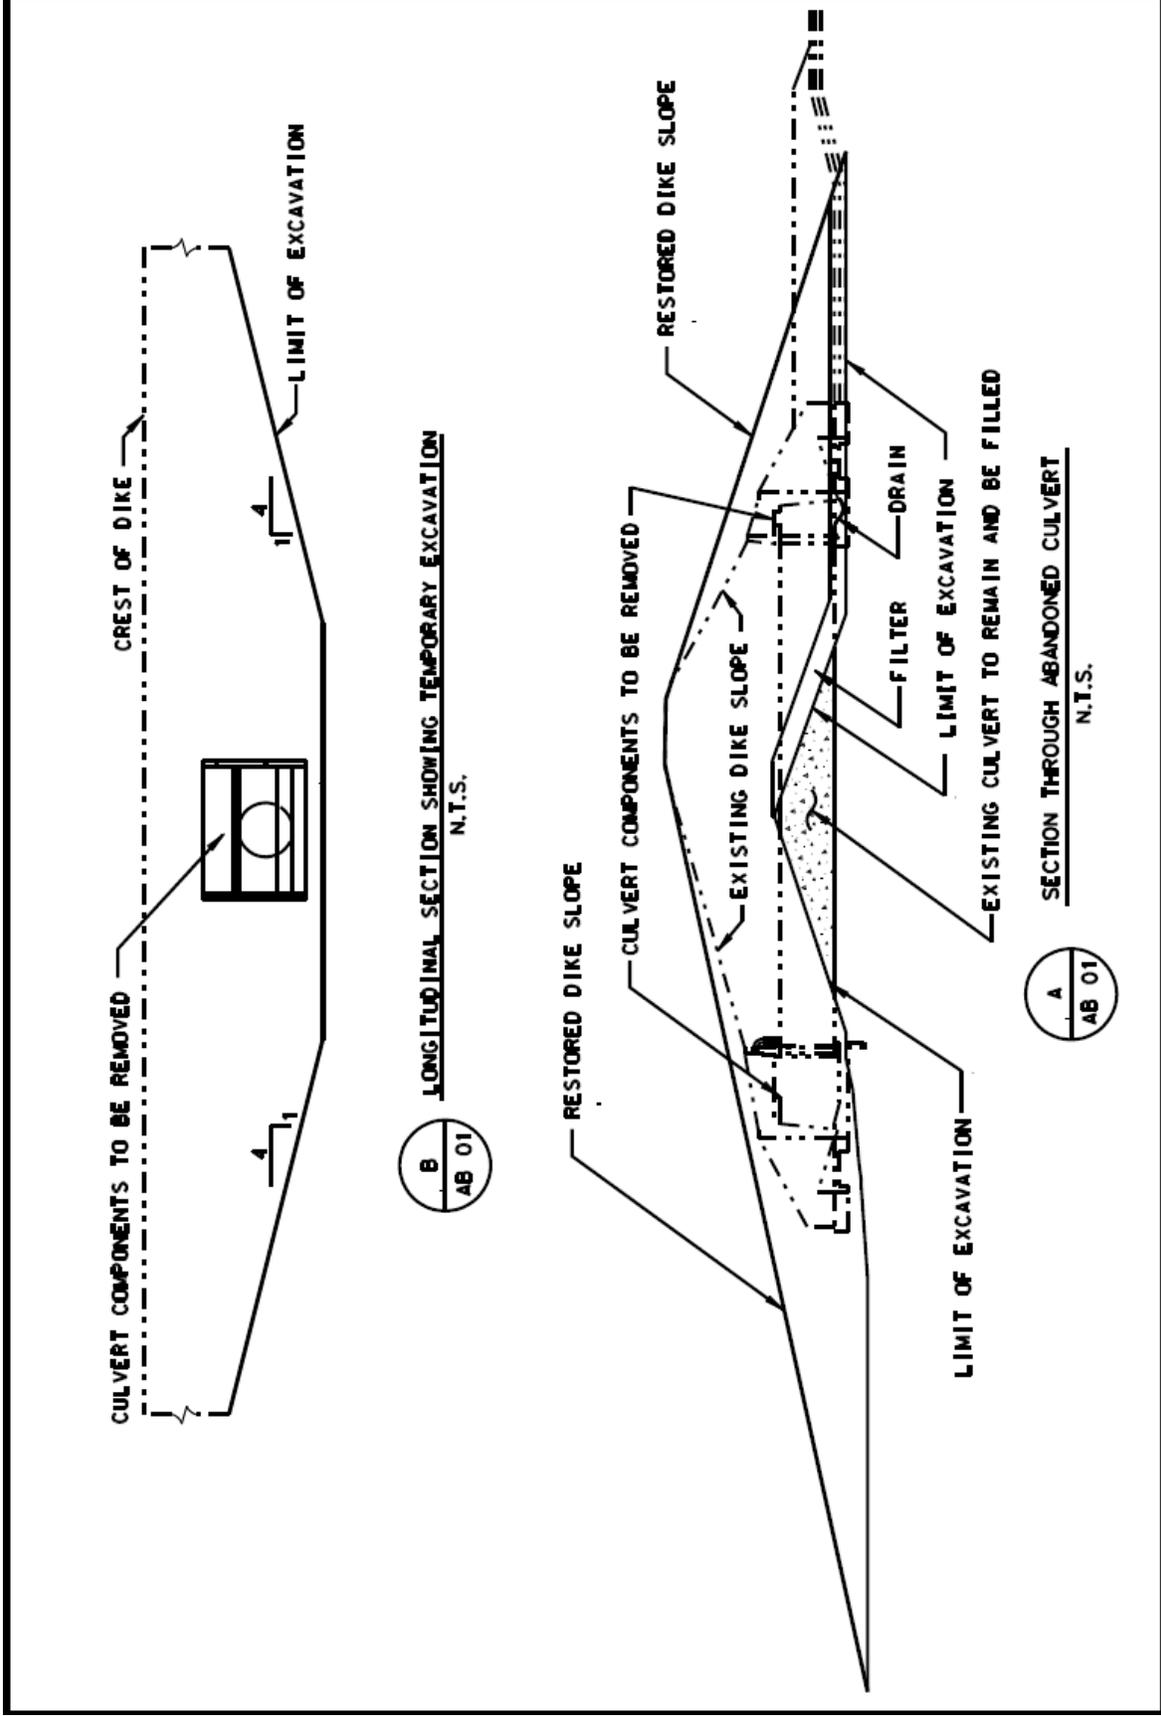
CULVERT 14 ABANDONMENT CROSS SECTION
